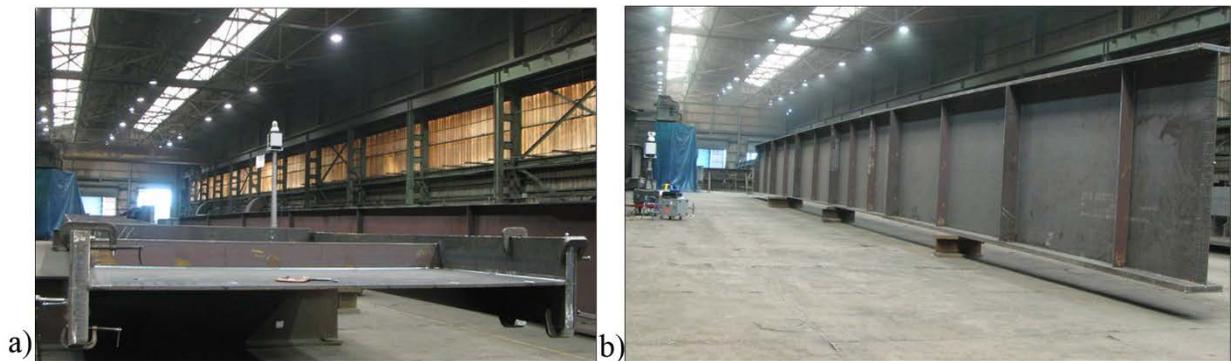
Girder 11B1-1 Camber Measurements with a) Girder on Side and b) Girder in Standing Position
